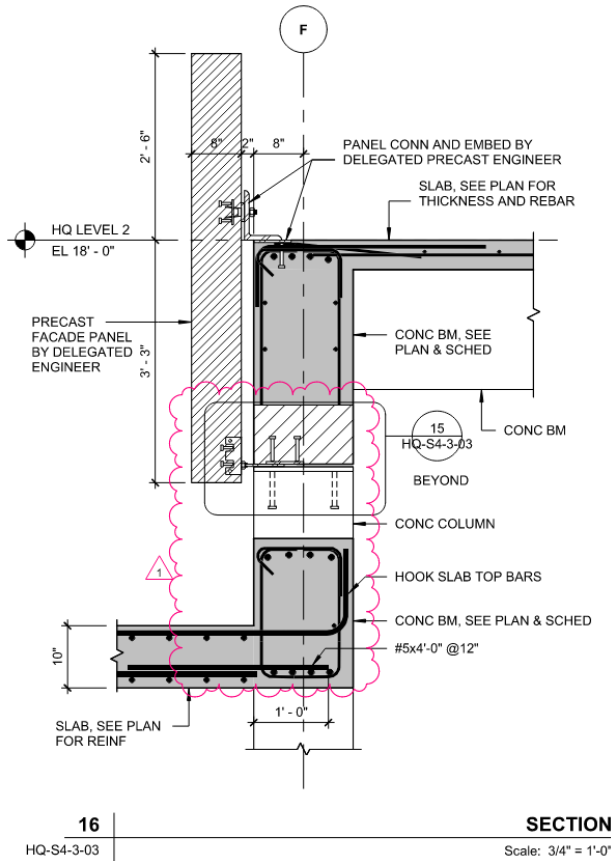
Section through joint between Area E and the main building of the FLPHQ showing the lower beam from Area A the stub column above, and the upper beam from the main building of the FLPHQ. The slide bearing is located at the top of the stub column
